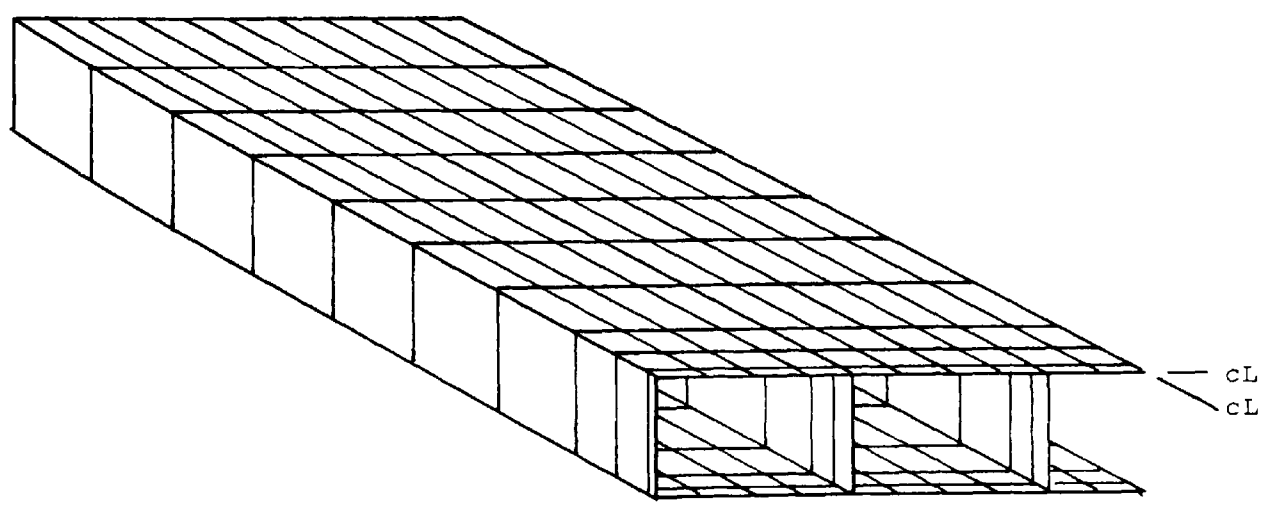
TRANSVERSE GRILLAGE BEAM CONVERGENCE STUDY
